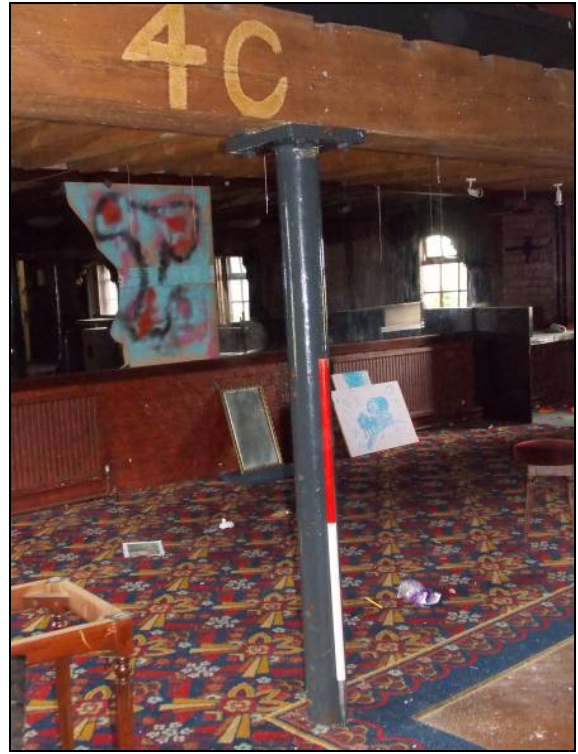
Detail of cast-iron column, looking north (scale 1m).
